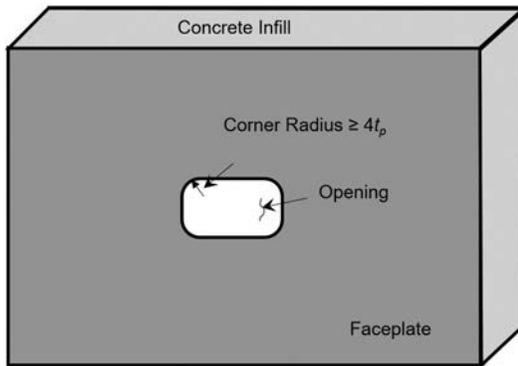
Radius of reentrant corners (elevation view of the SC panel section).
